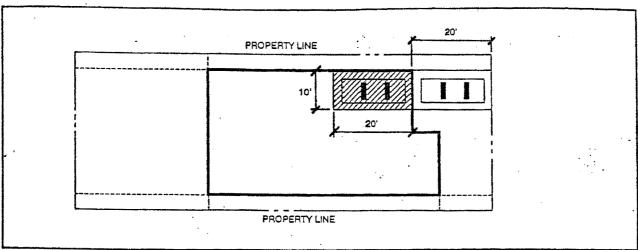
Parking Space Shown in Front Yard Area with Minimum 20' Setback to Building.
